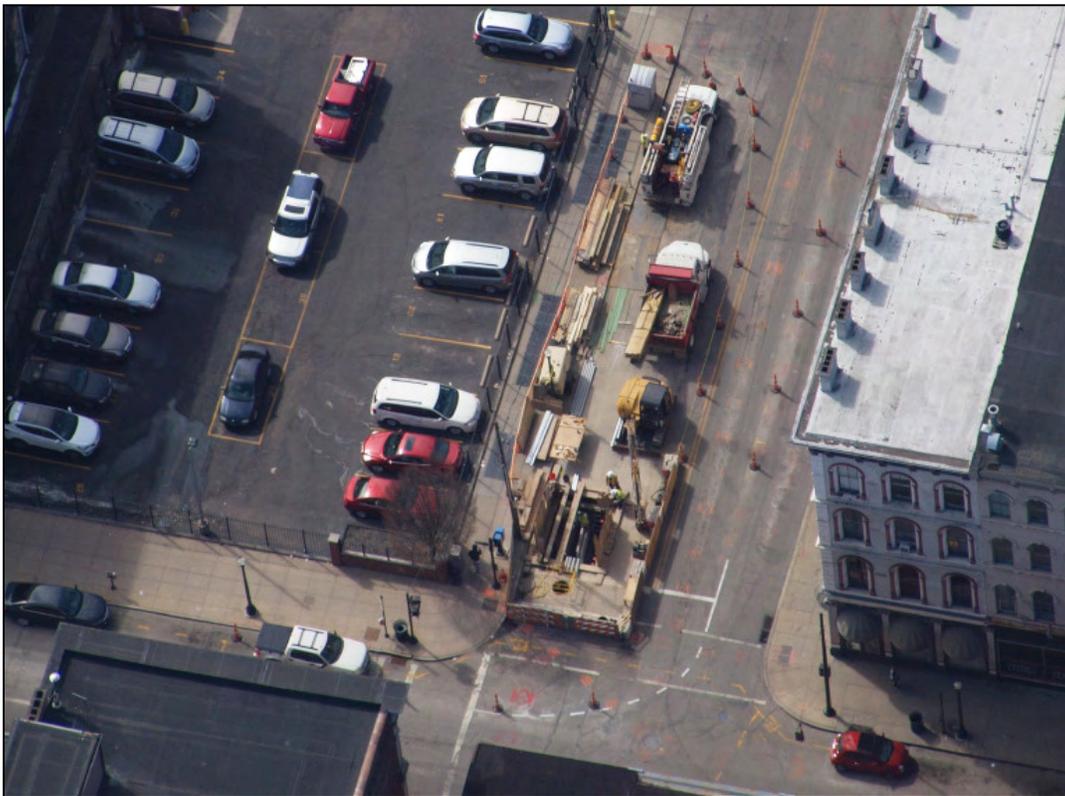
Duke Energy electric manhole replacement on 12th Street at Main Street.
